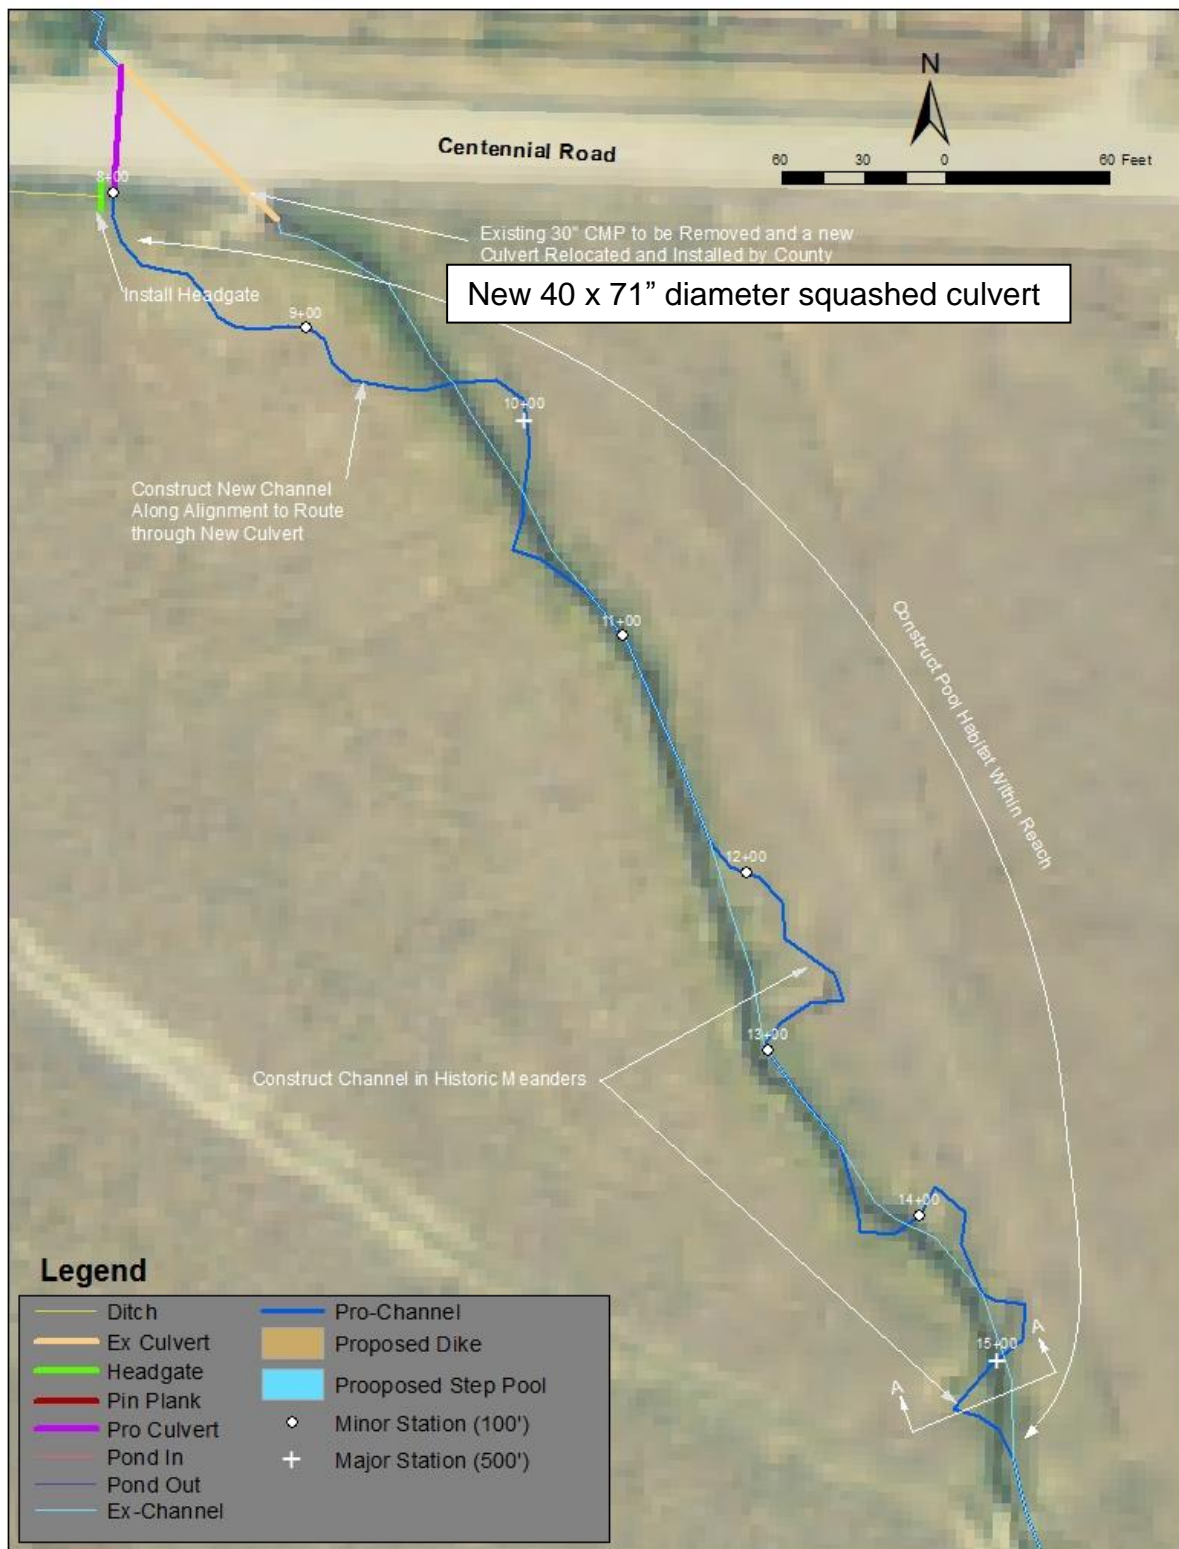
Plan View of Bean Creek on the South Side of Centennial Road.
